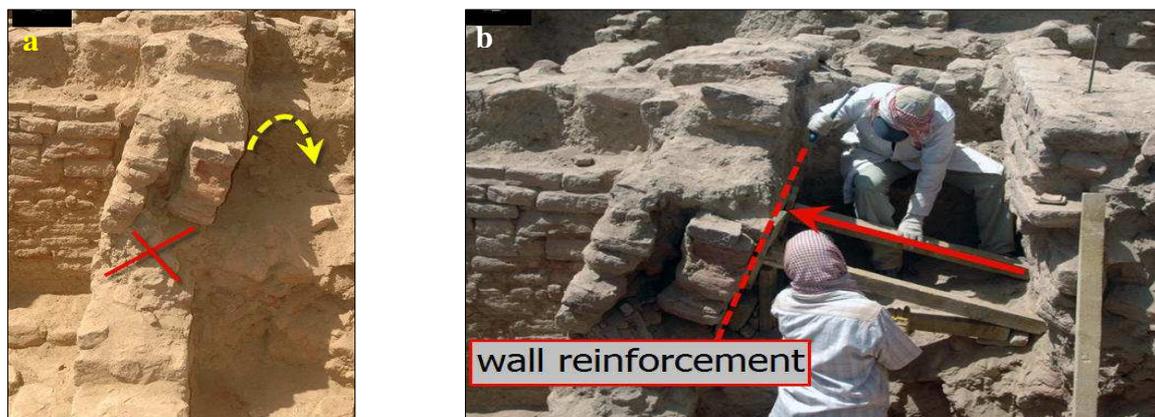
Shows a, tending wall after discovering, b, diagonal and horizontal reinforcement
